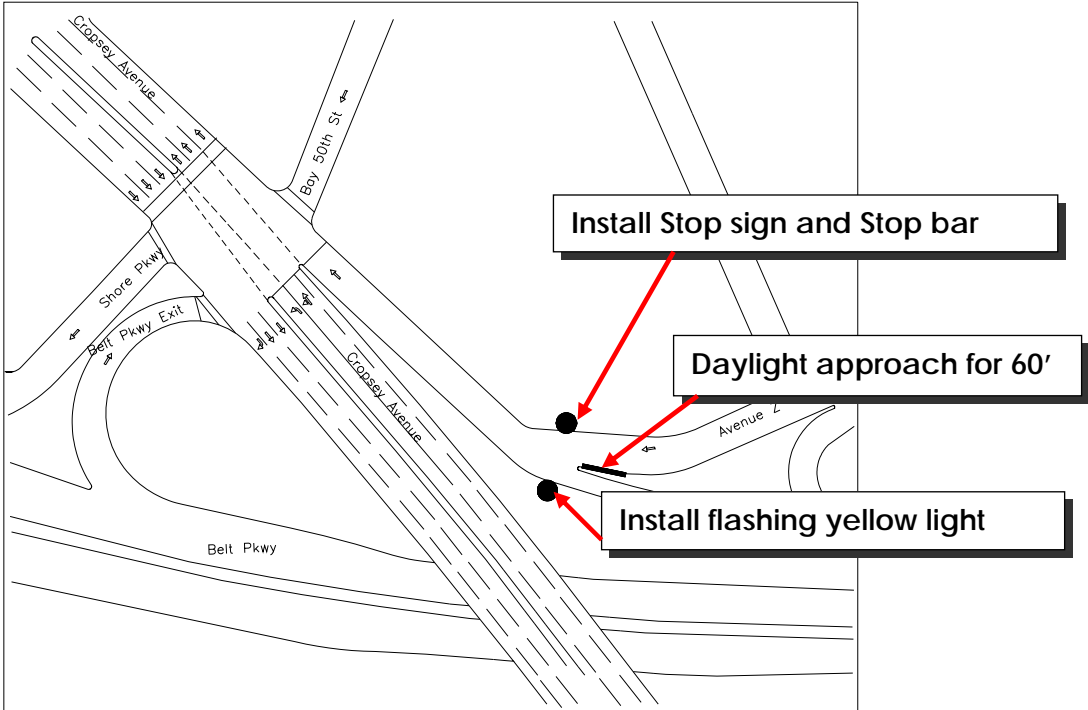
Cropsey Avenue/Avenue Z/Shore Parkway Exit - Proposed Condition
